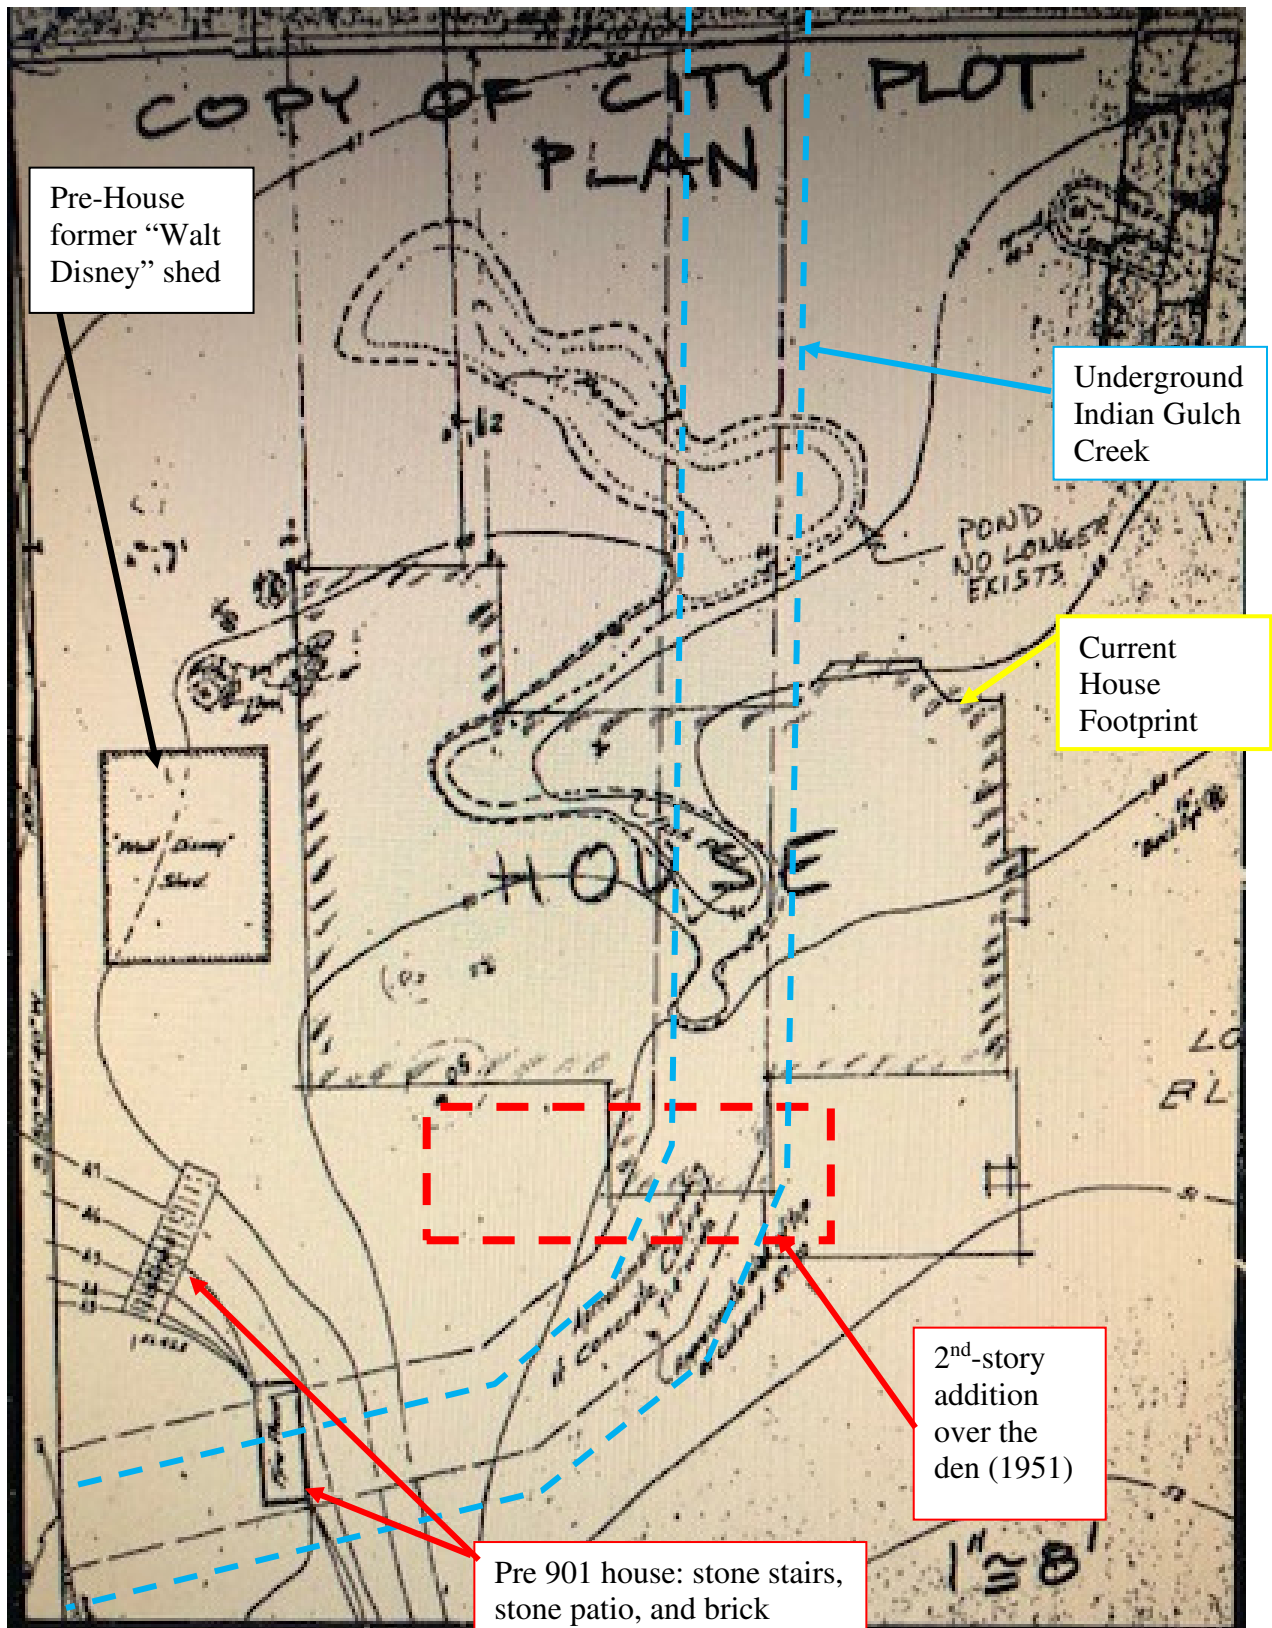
Plot Plan of 901 Trestle Glen and illustrating the proposed house footprint over the existing drainage culvert and former "fish pond" under the residence.
